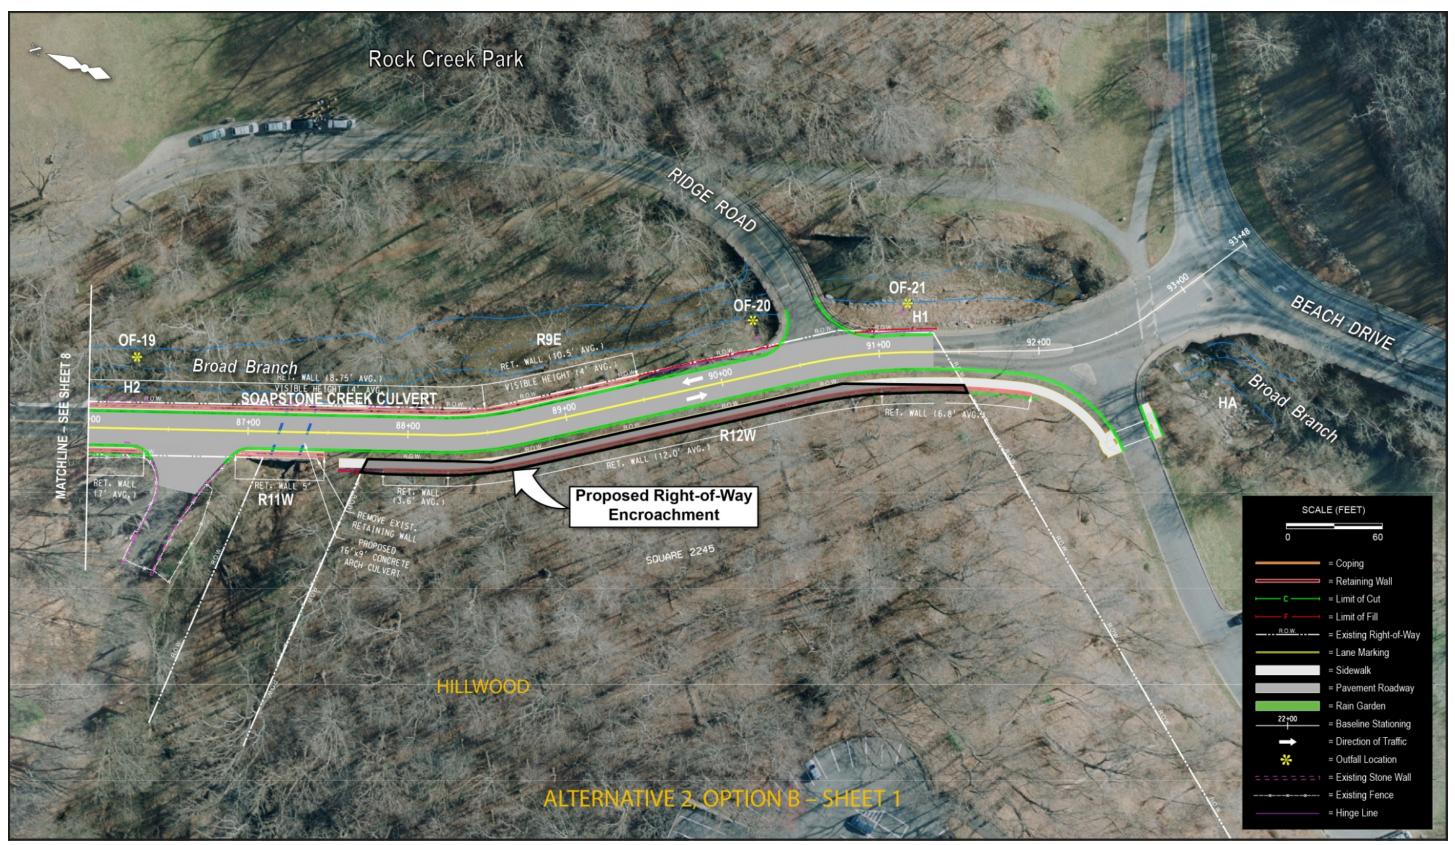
Roadway Features and Proposed Right-of-Way Encroachment - Alternative 2, Option B
